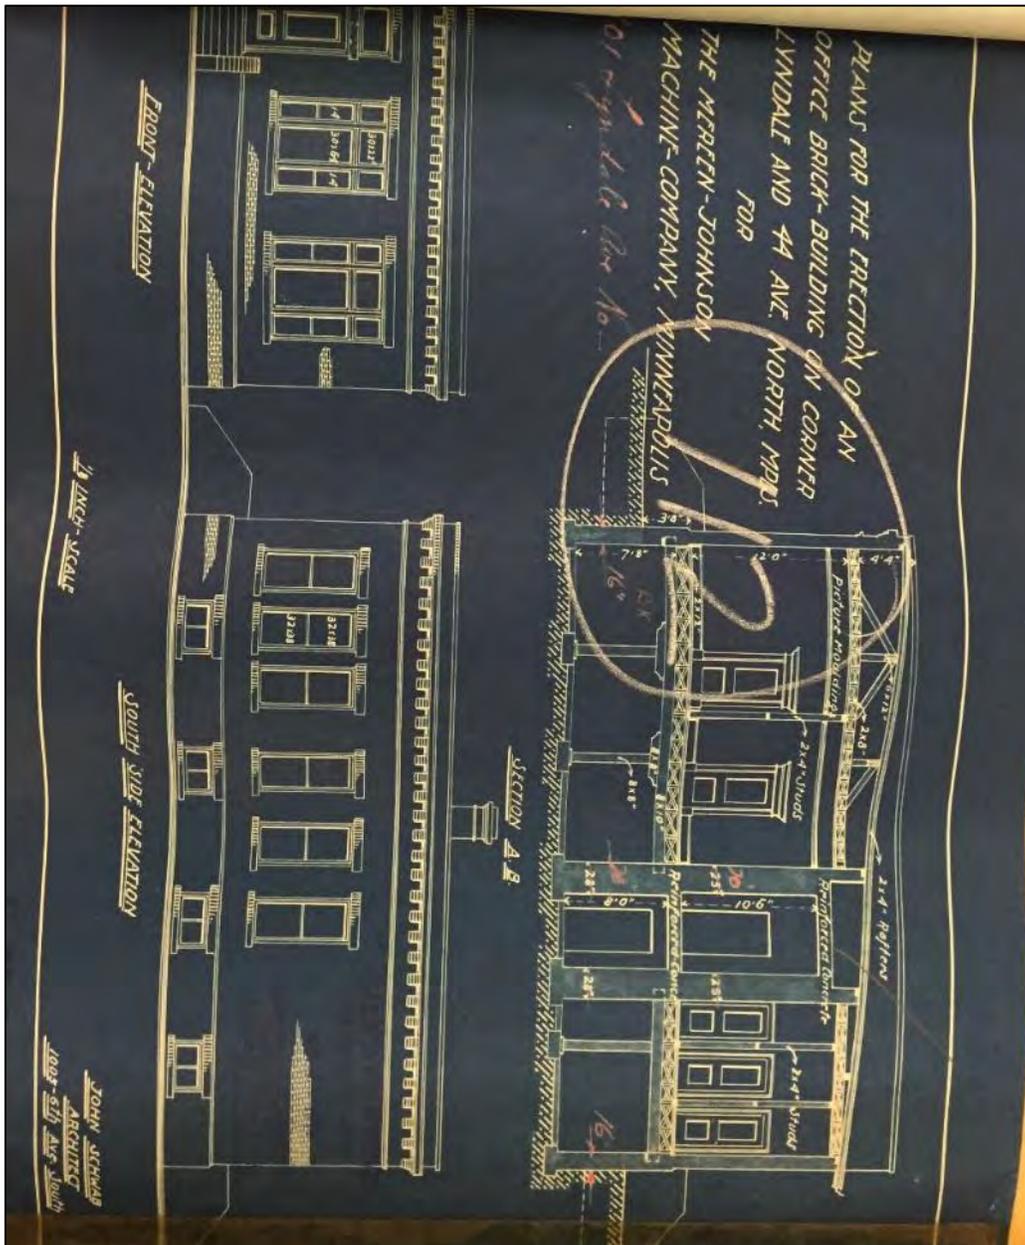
Merren Johnson Office Building front elevation, south side elevation, and section A and B elevation. "Merren-Johnson Machine Company," Minneapolis Plan Vault Collection, Box 304, Northwest Architectural Archives, University of Minnesota.
